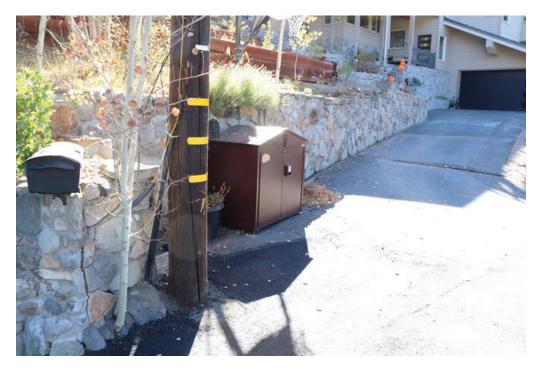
Panned right from previous photograph. View of neighbor's retaining wall.
